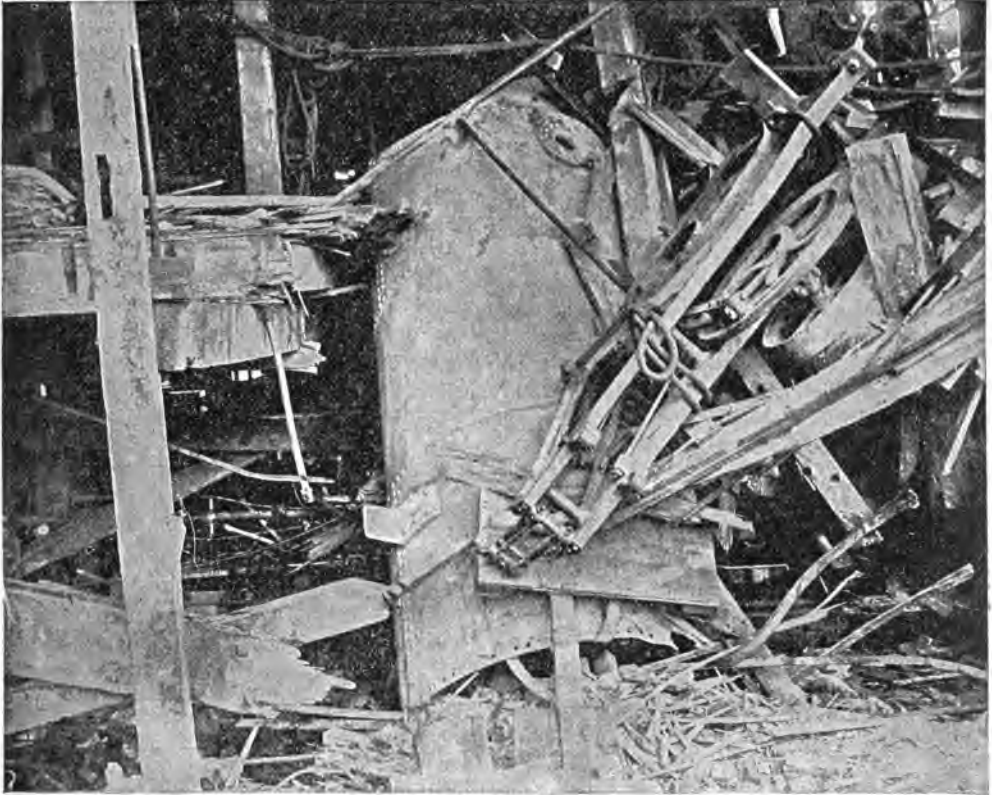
SOME DETAILS OF THE WRECKAGE.
